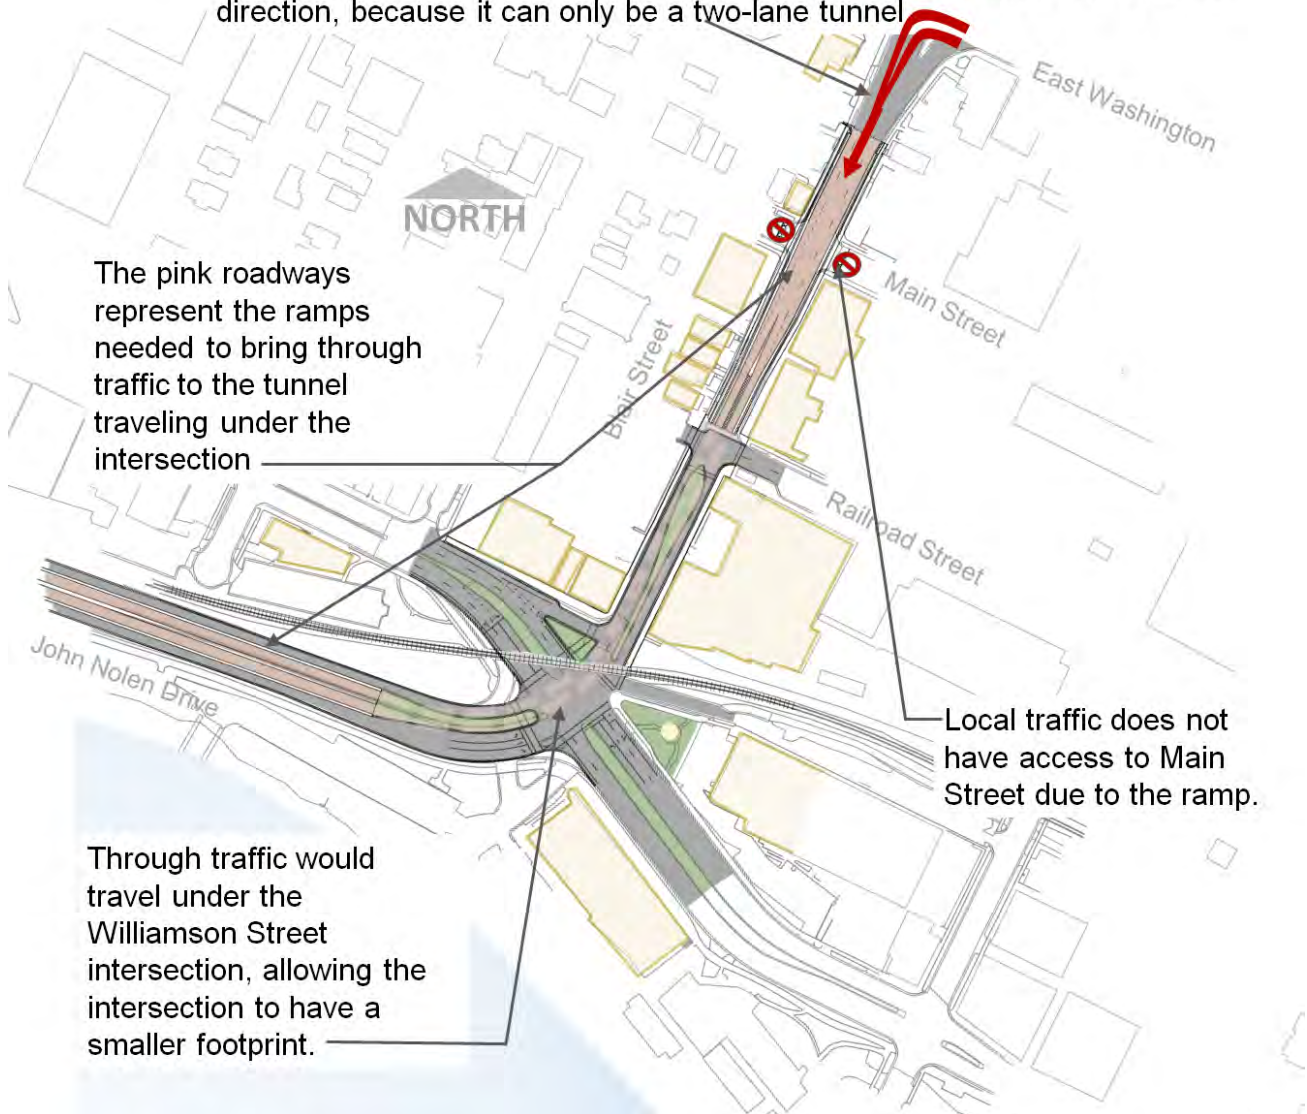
John Nolen Drive/Blair Street Tunnel Concept Option 2
